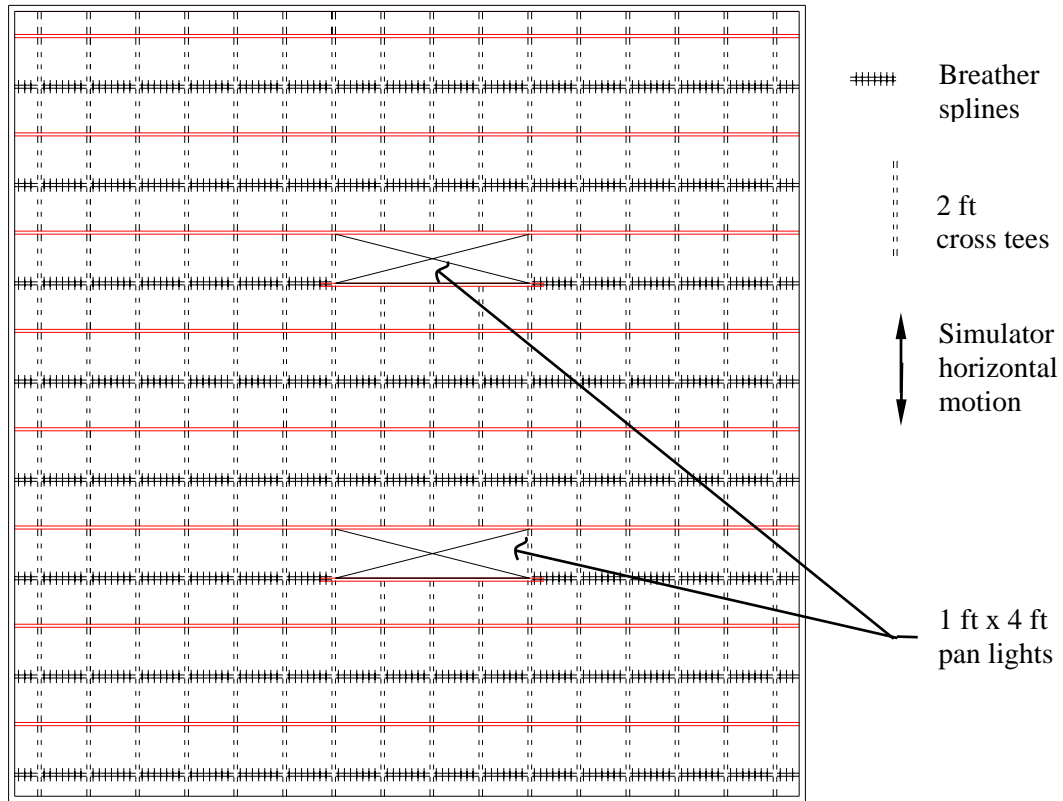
Layout of splines and cross tees in ceiling system CS3.
